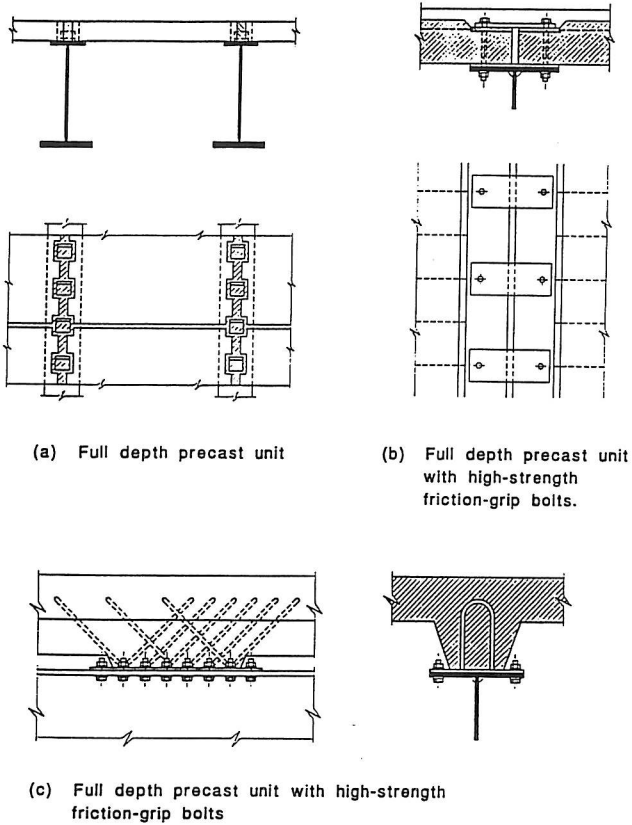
Means of eliminating conventional formwork for reinforced concrete decks.
